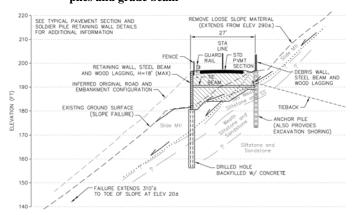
B. Conceptual design alternative for Station 176 showing a soldier pile and lagging retaining wall laterally supported with steel tie beams connected to an upslope row of anchor piles with tieback anchors
